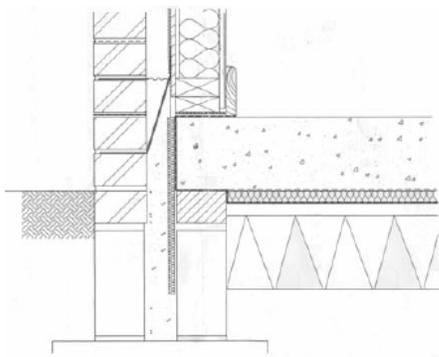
Typical ground floor slab perimeter detail for timber frame.
